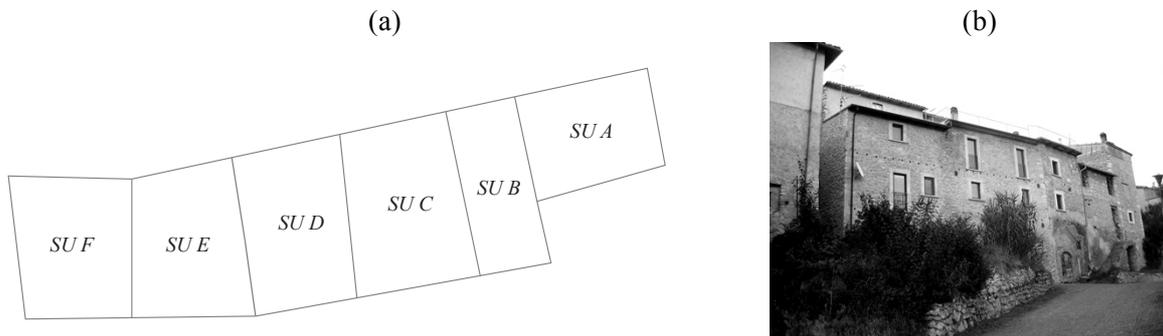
Structural units *S.U.* of the evaluated building aggregate (a) and the corresponding south façade (b)
